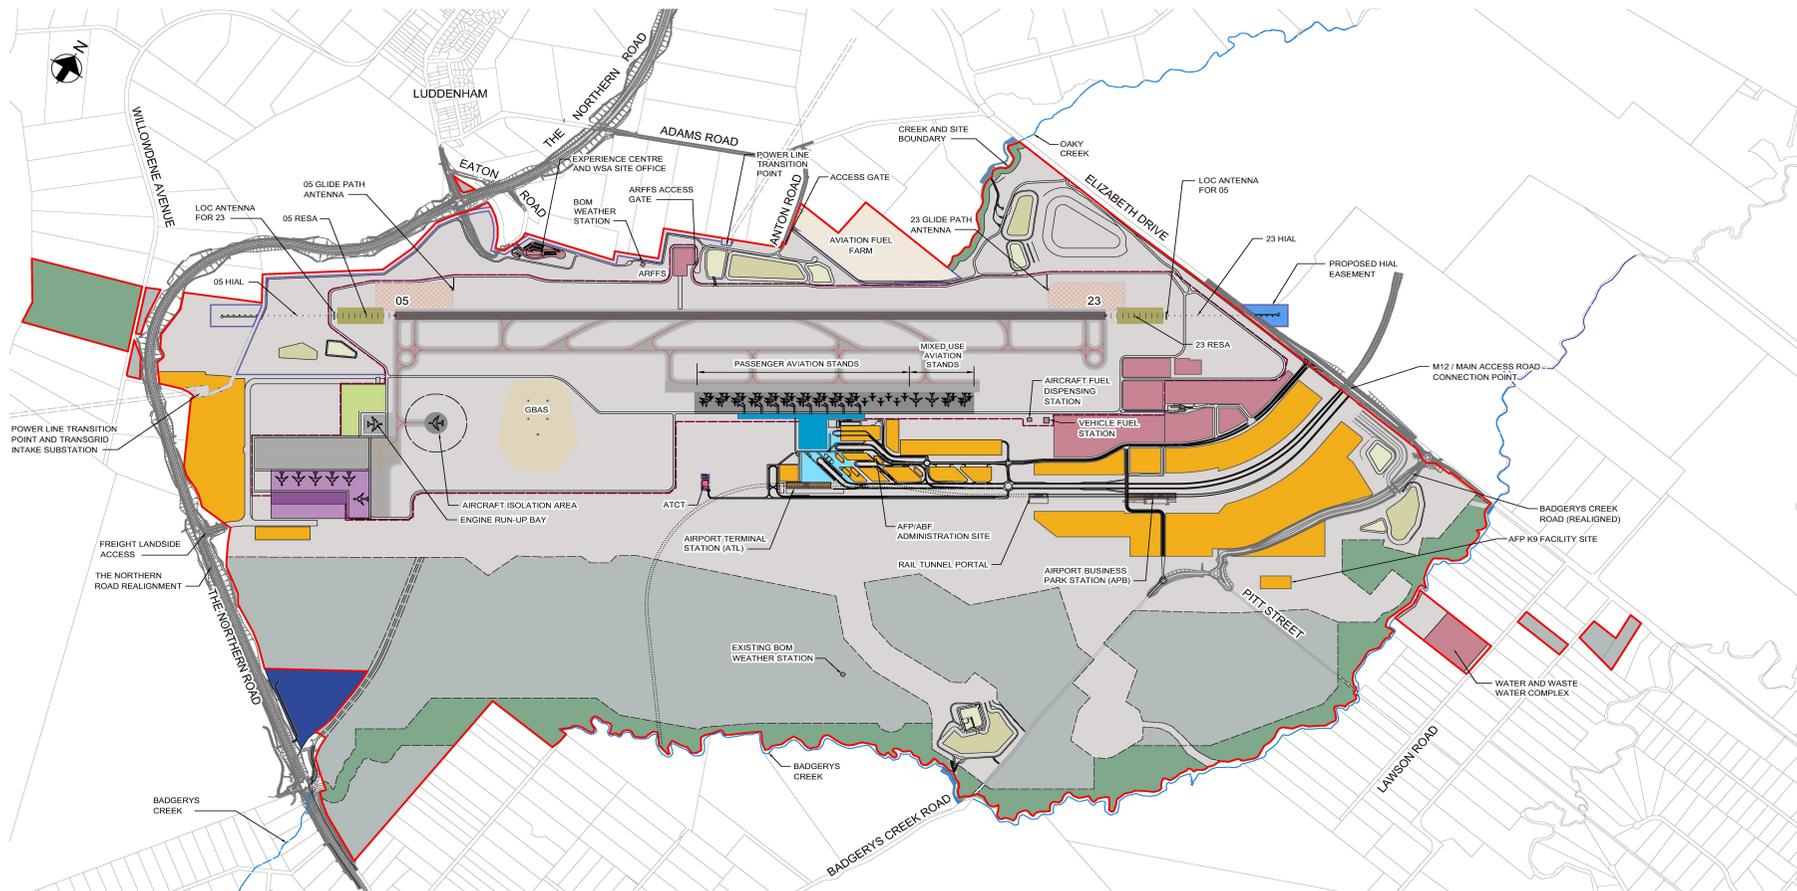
Final Airport Site Layout (FASL) – as approved November 2020
